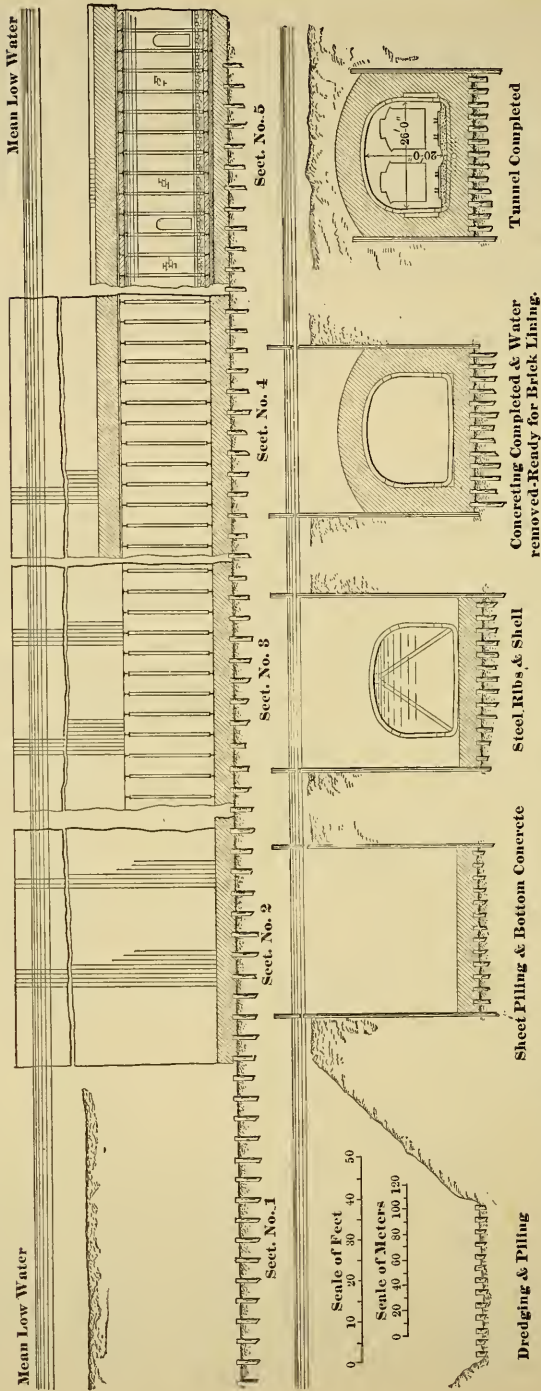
GENERAL PLAN OF TUNNEL, CONSTRUCTED OF CONCRETE PLACED UNDER WATER.
